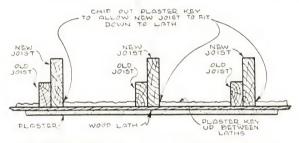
Putting New and Larger Joists in an Old Ceiling
